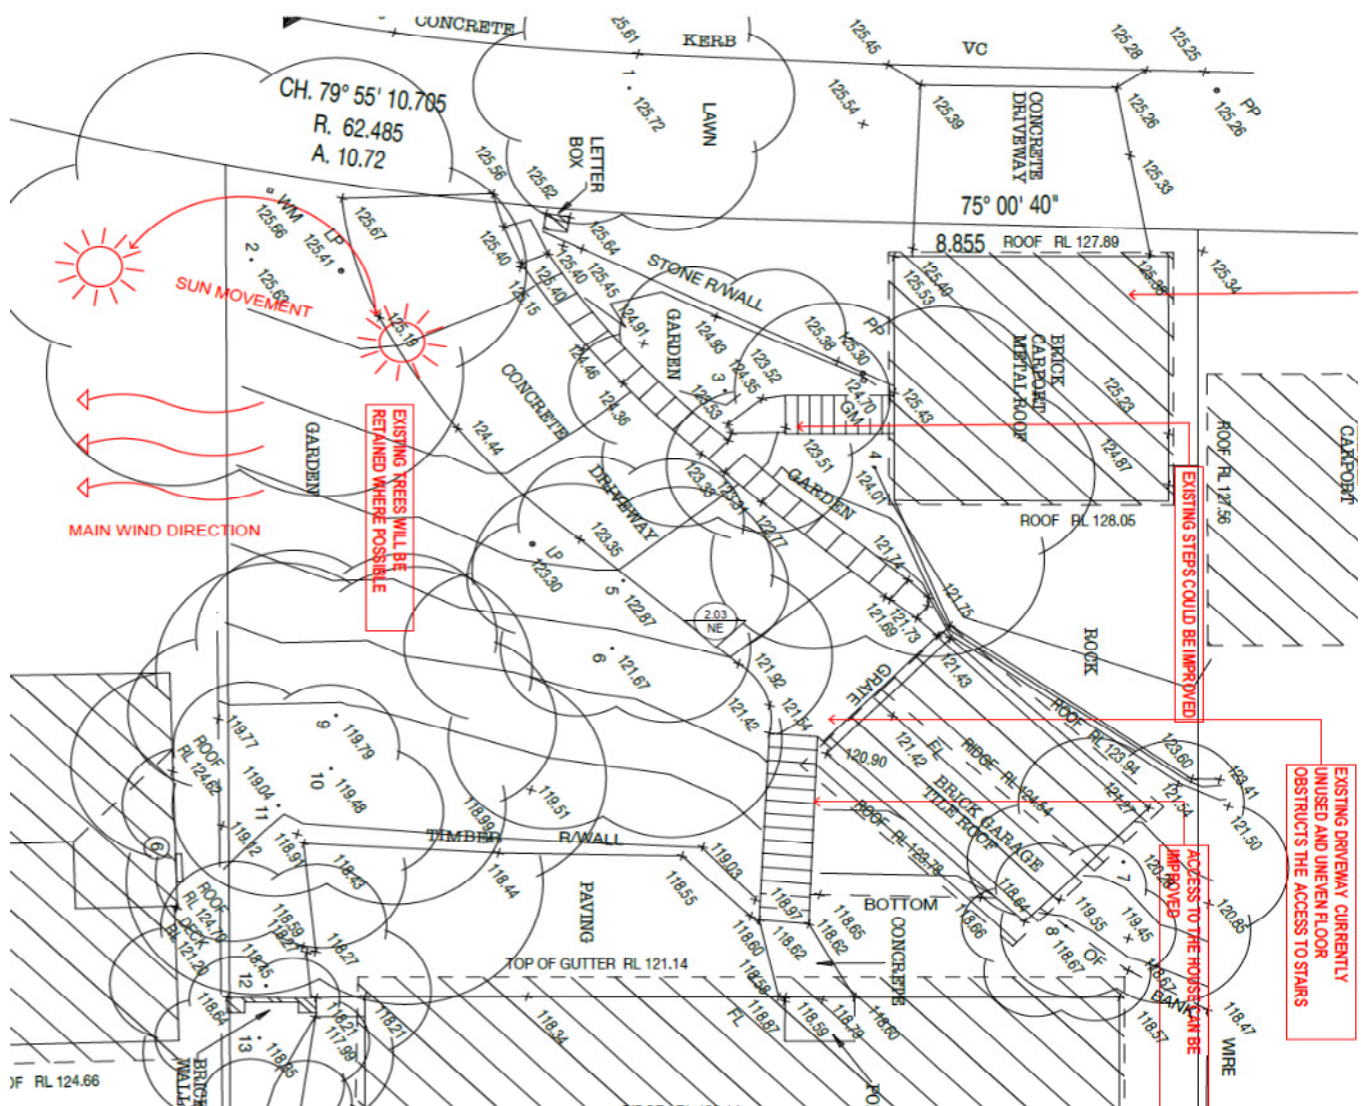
Survey plan - Existing trees adjacent to proposed works
